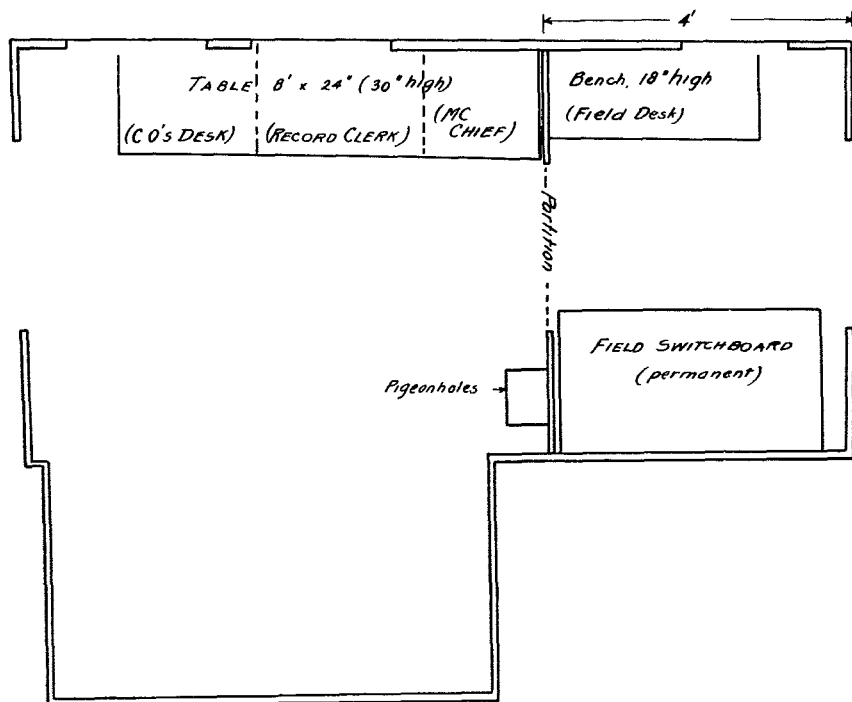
FLOOR PLAN AND ARRANGEMENT (Interior)
